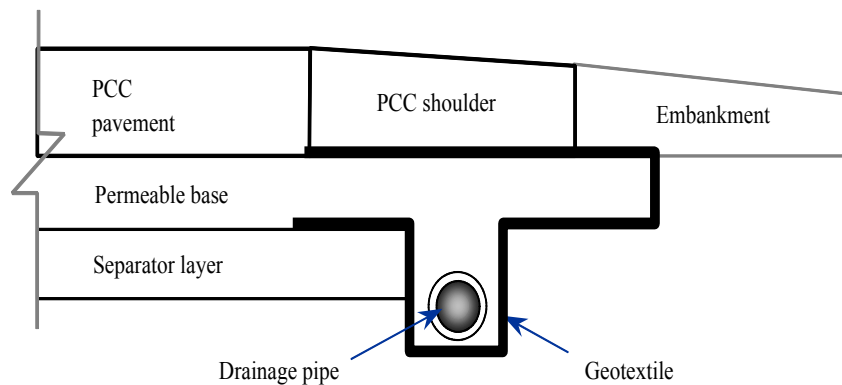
The recommended design of PCC pavement with a permeable base (ERES, 1999).
